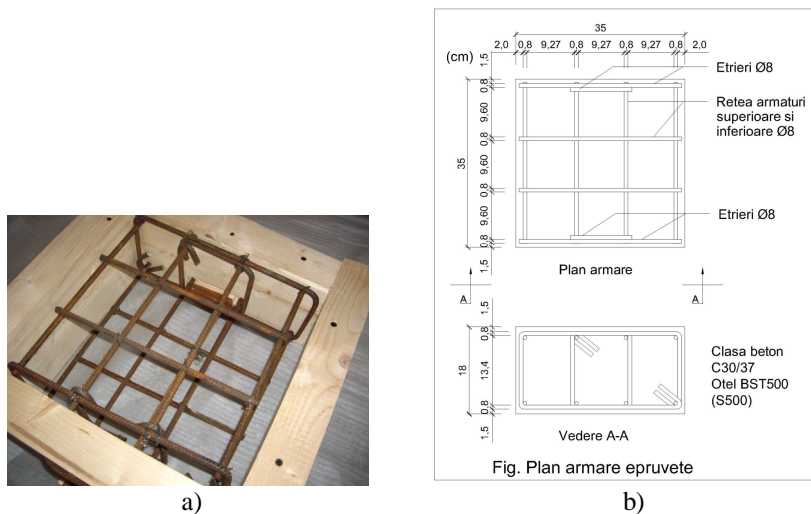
Realization of specimens: a) formwork; b) reinforcement detail.
